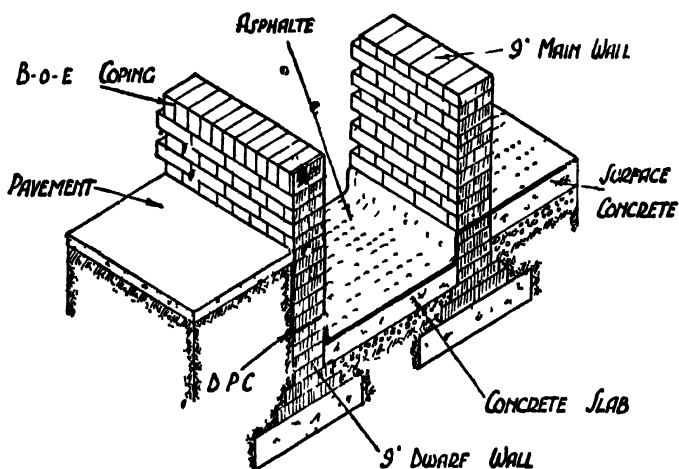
DWARF WALL SURROUND TO OPEN AREA
